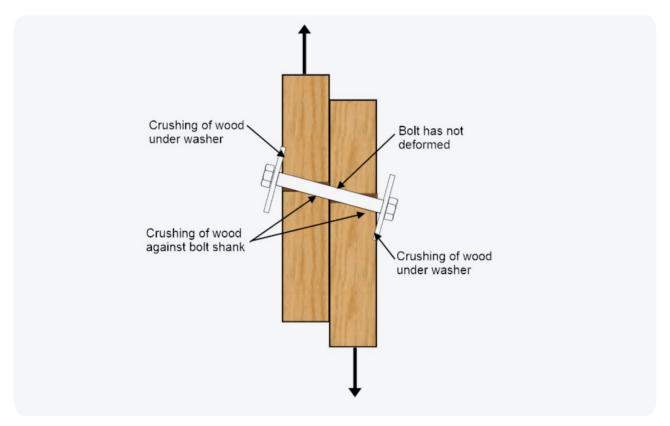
Behaviour of a bolt in a timber to timber connection. (Image credit: TDA)
